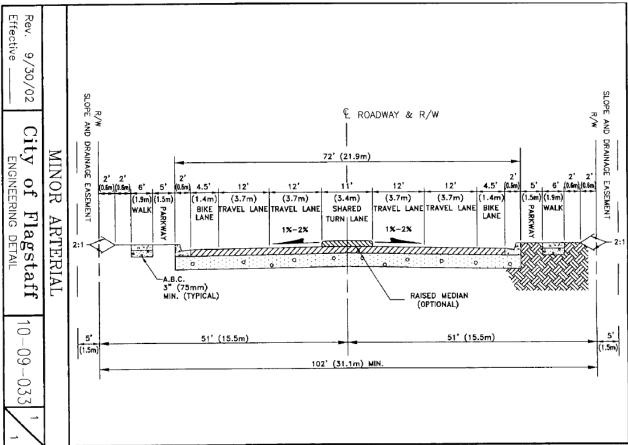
Lone Tree Corridor Study - Typical Section (page 32)
